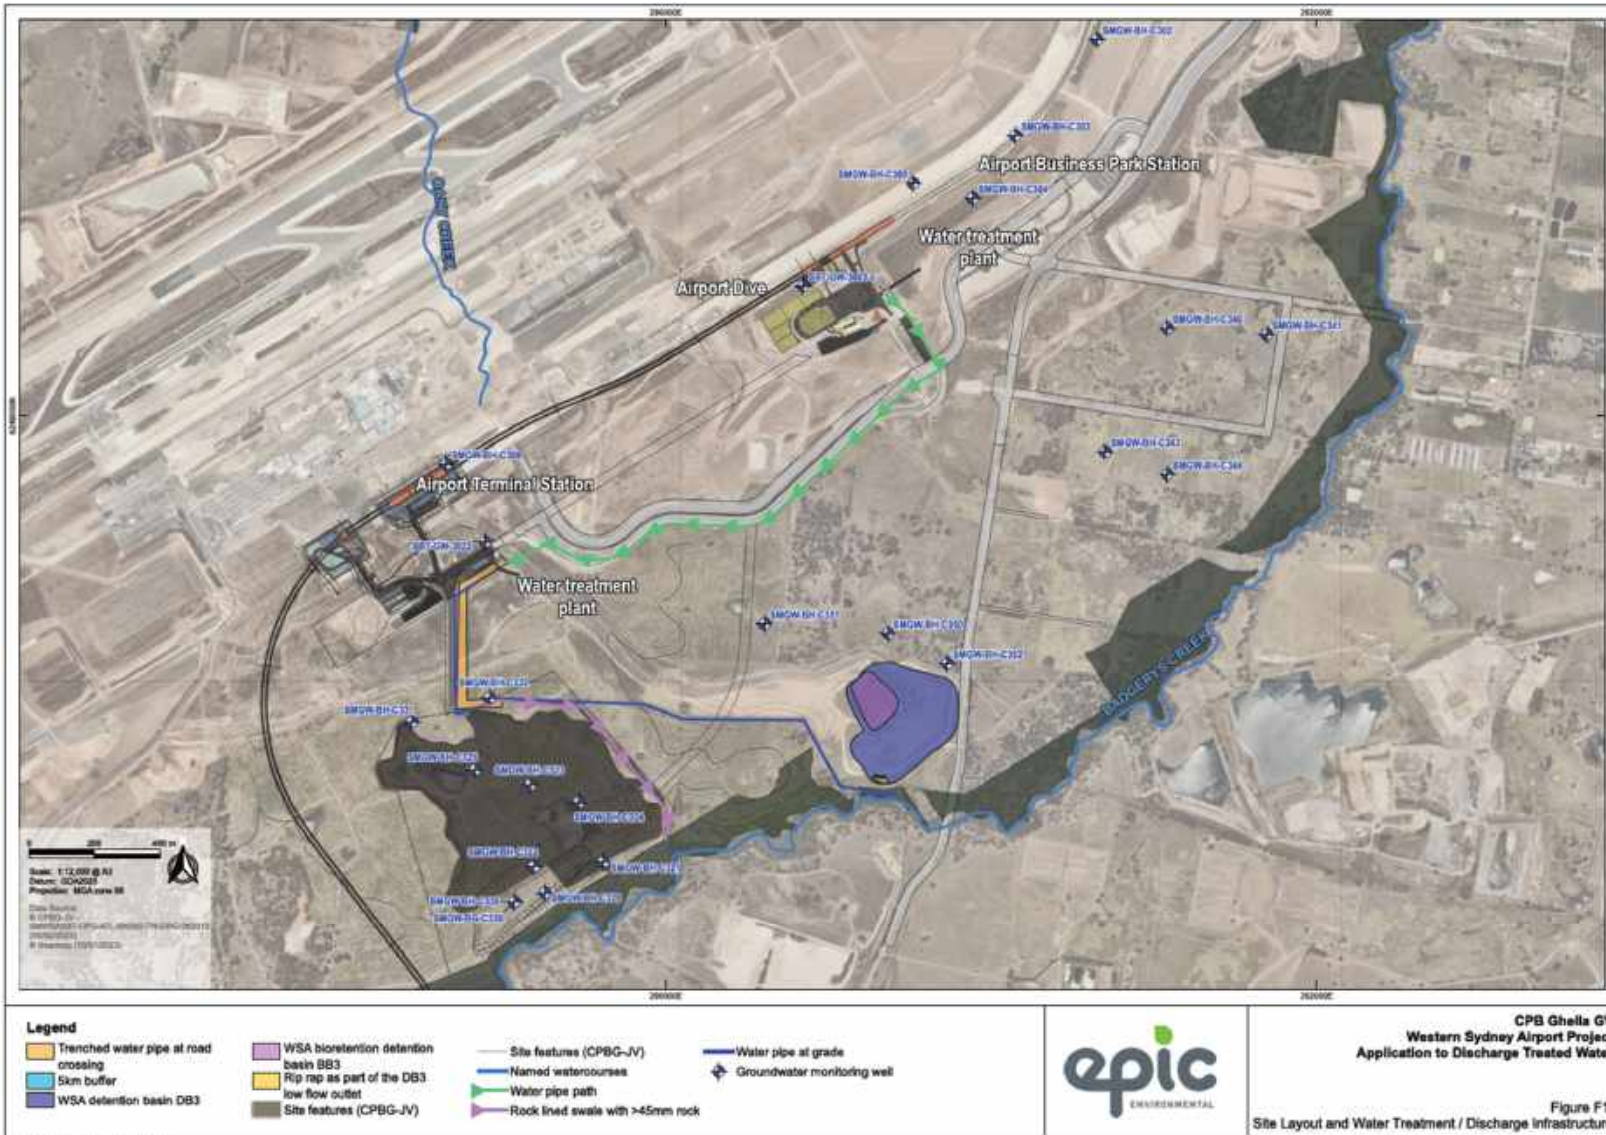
On-Airport Site Layout, Water Treatment Plants, and Wastewater Discharge Infrastructure
